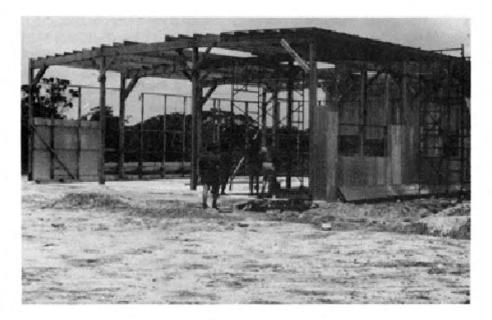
LOJWA BUILDING CONSTRUCTION.
